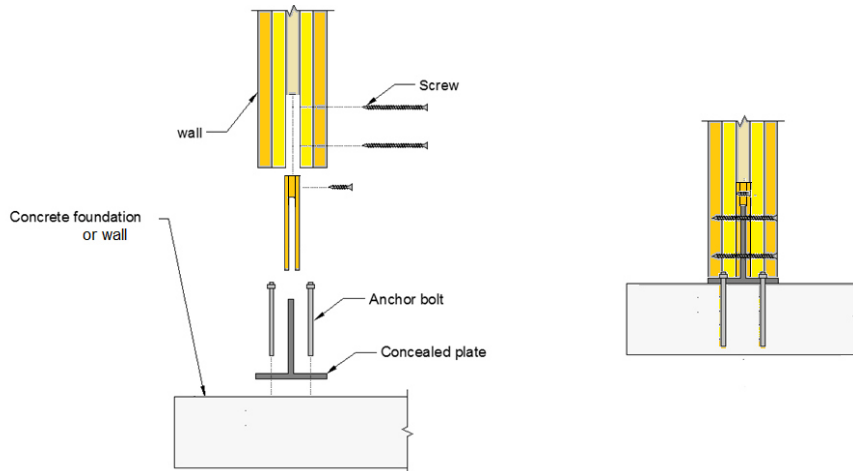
Concealed plate bracket connection for wall-to-concrete/masonry foundation or wall-to-concrete/masonry wall.
